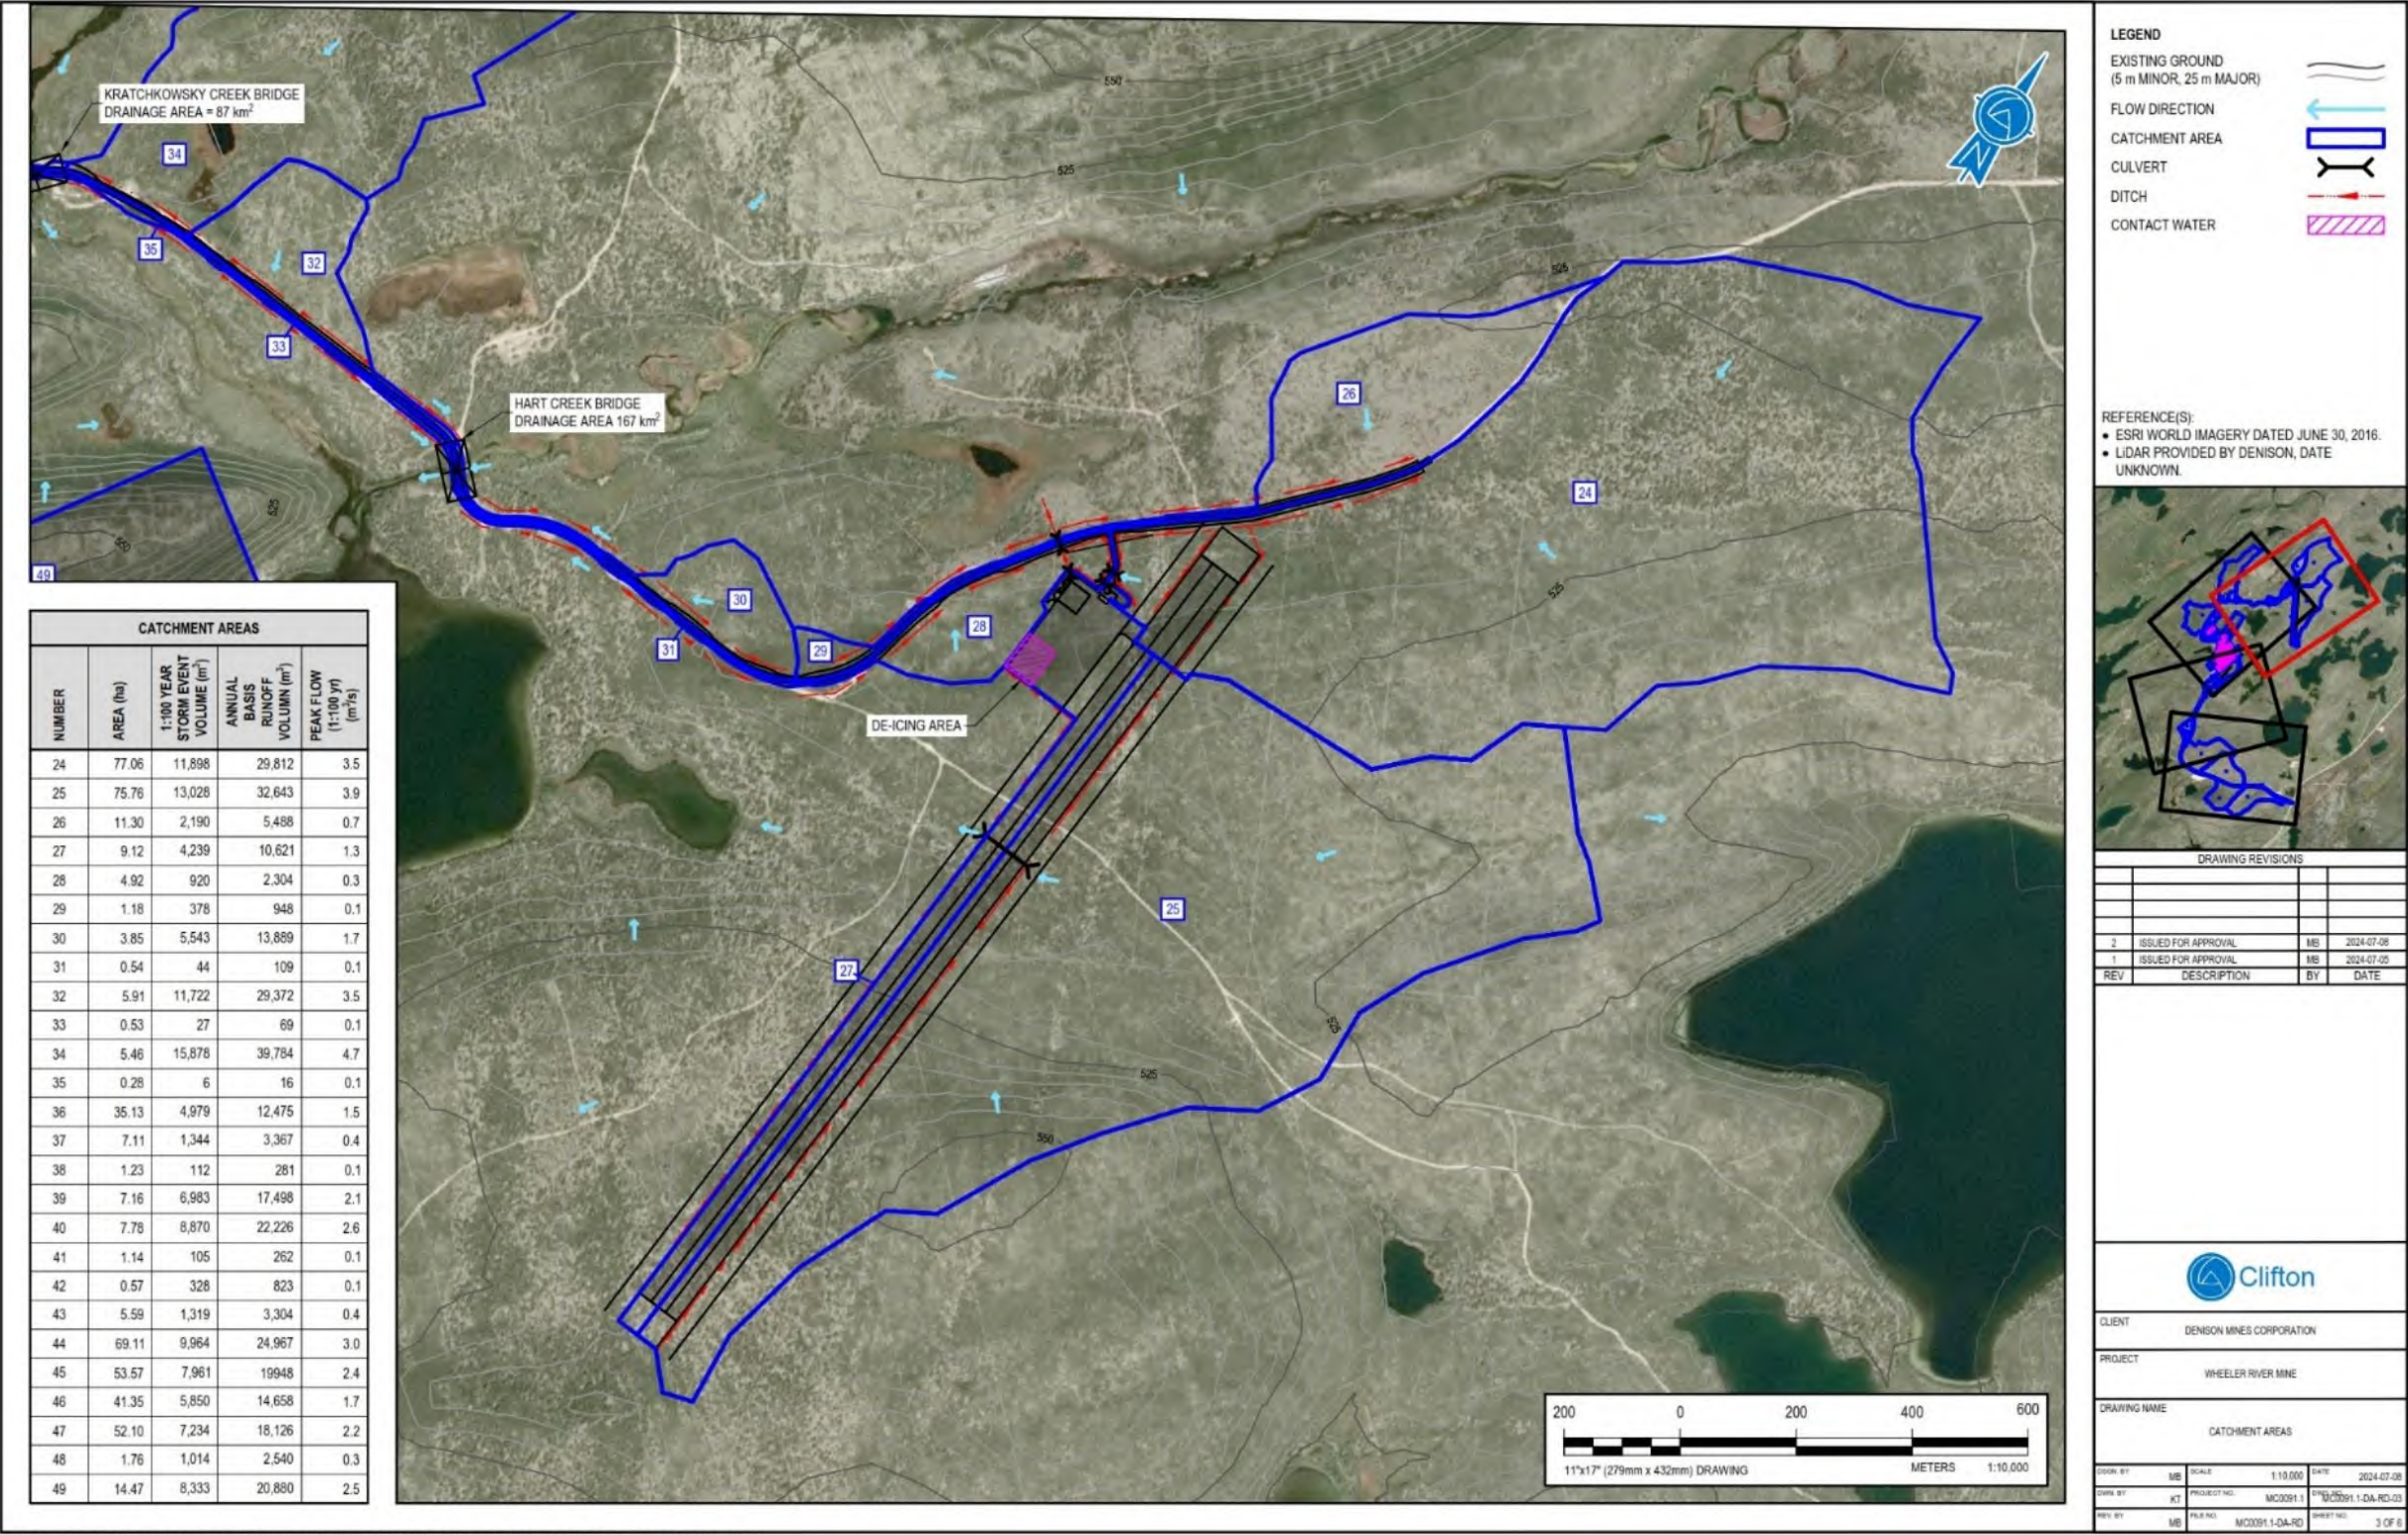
Site water management catchment areas – layout 1 of 5: Airstrip and portion of airstrip access road
